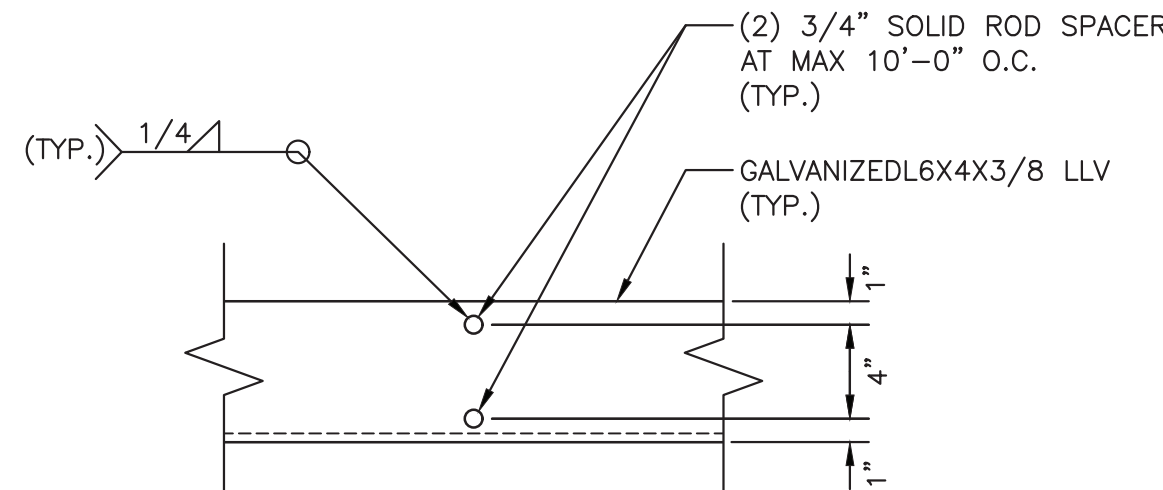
DETAIL - HSS BEAM TO COLONNADE CONNECTION
